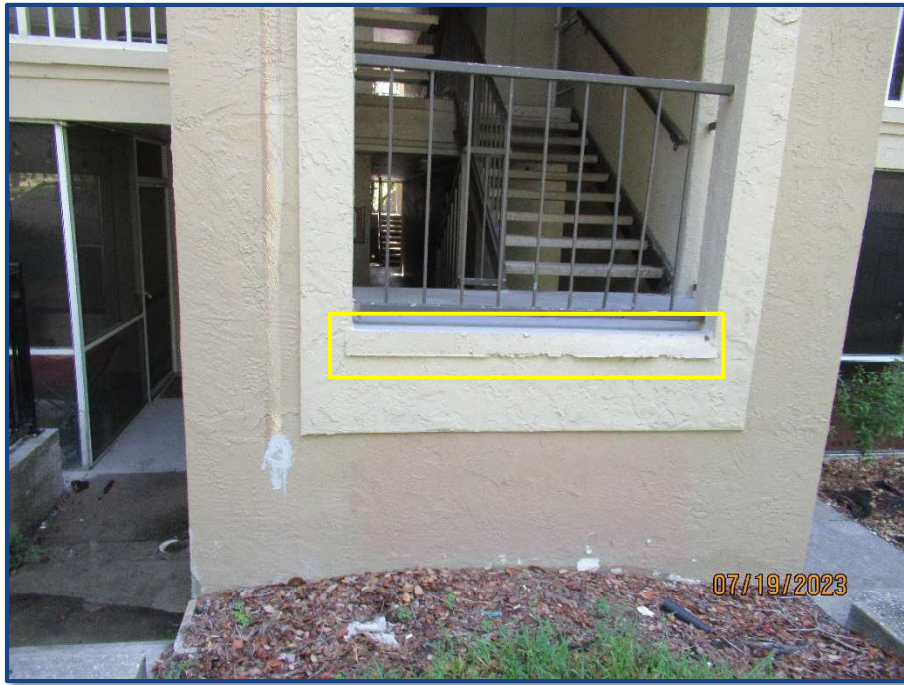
View of the balconies and stairway on the west side of the building.
